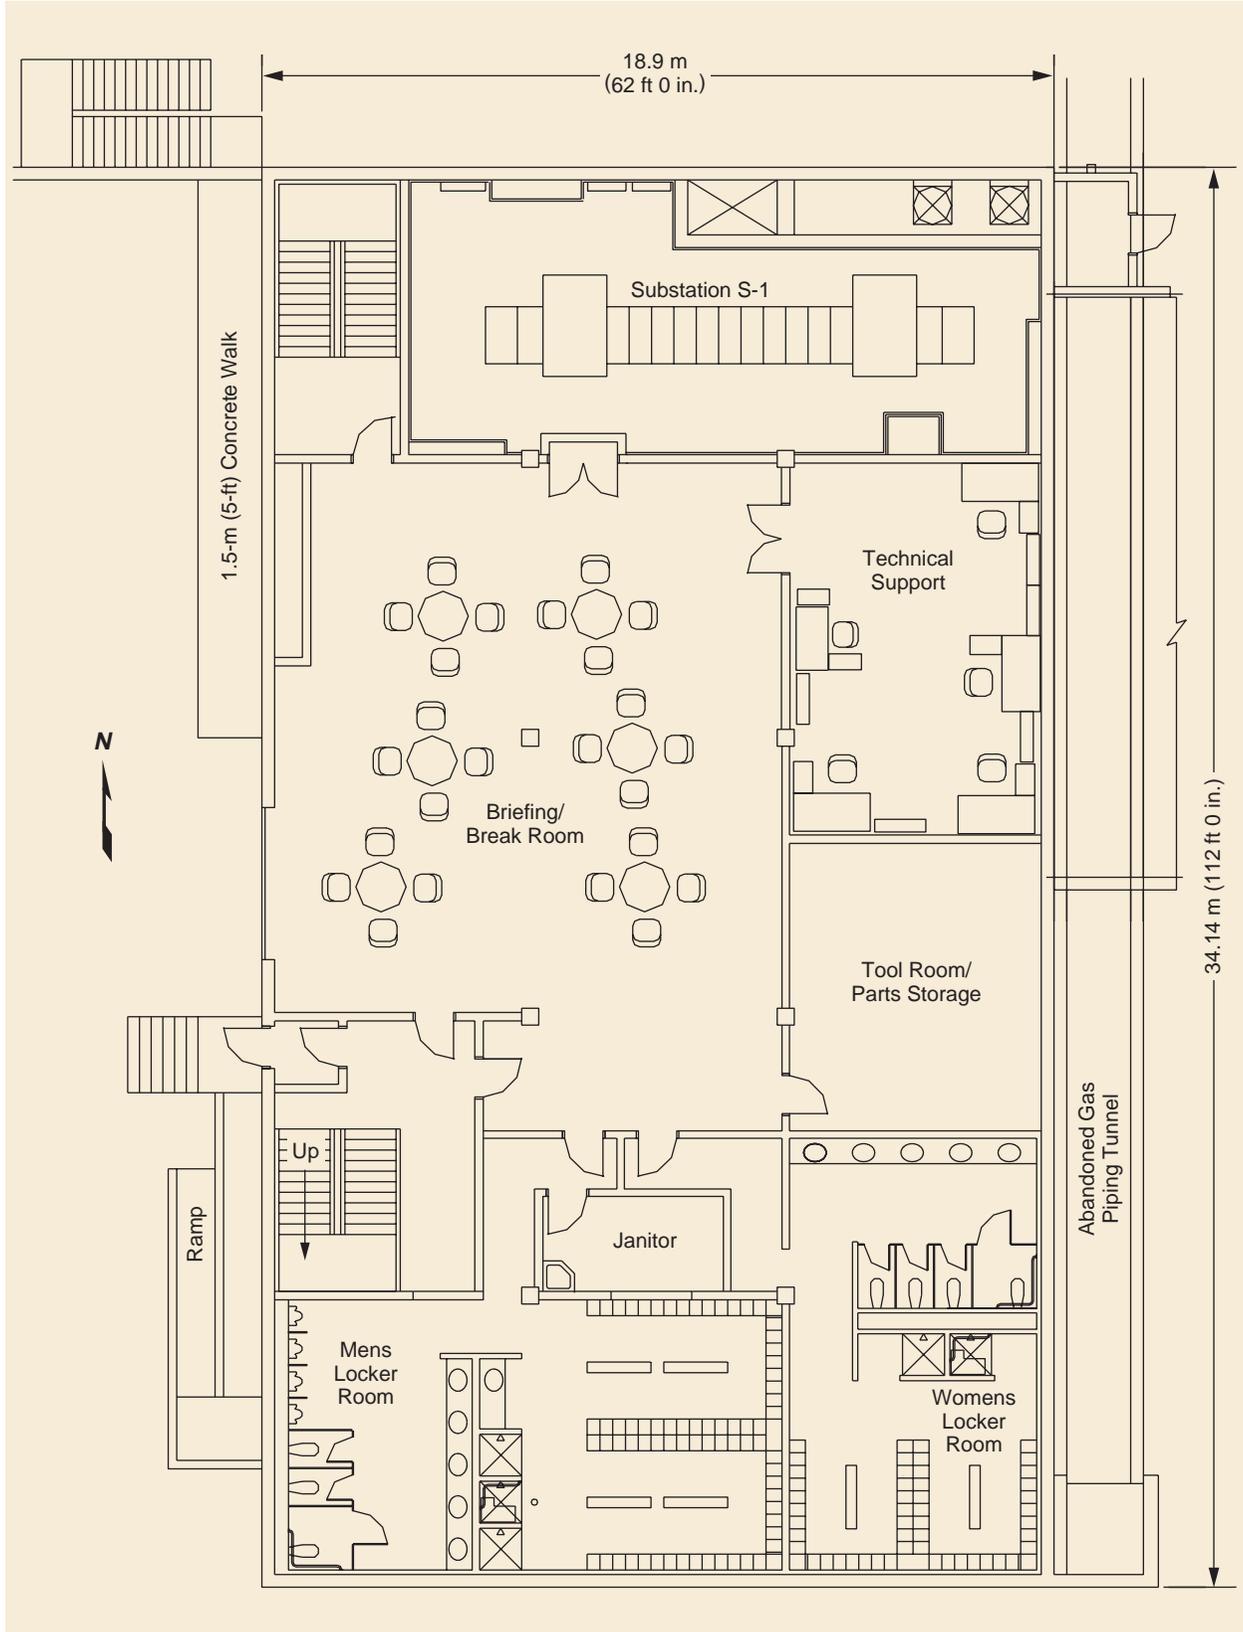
Support Equipment Building (SEB) (Building 395) Second-Floor Plan
